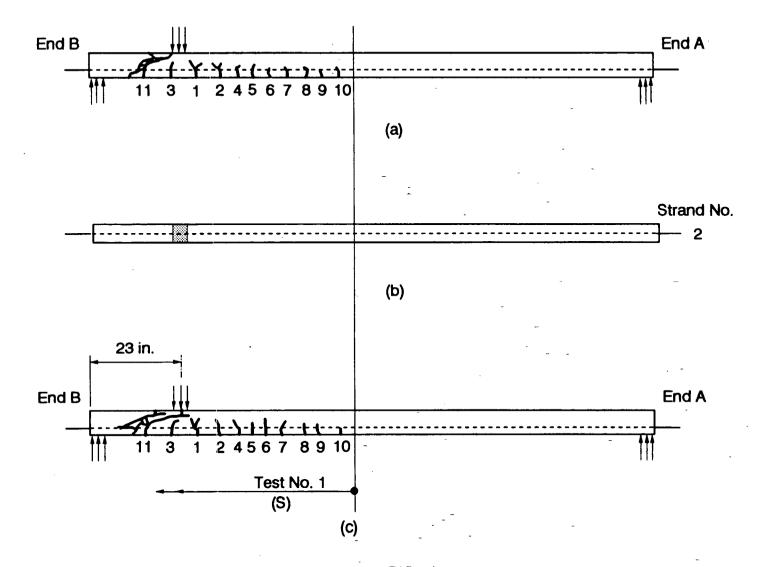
Crack pattern for D-type Specimen No. 17-6.0DC-2: (a) mirrored side view along Strand No. 2; (b) top view; (c) side view along Strand No. 2
